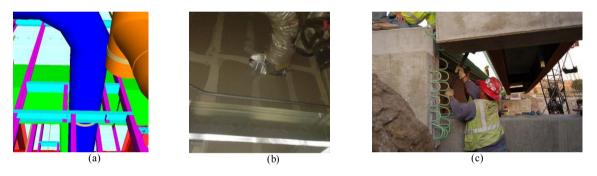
Misalignments between prefabricated structural components and building systems (a) as-designed; (b) as-built; (c) bridge misalignment
